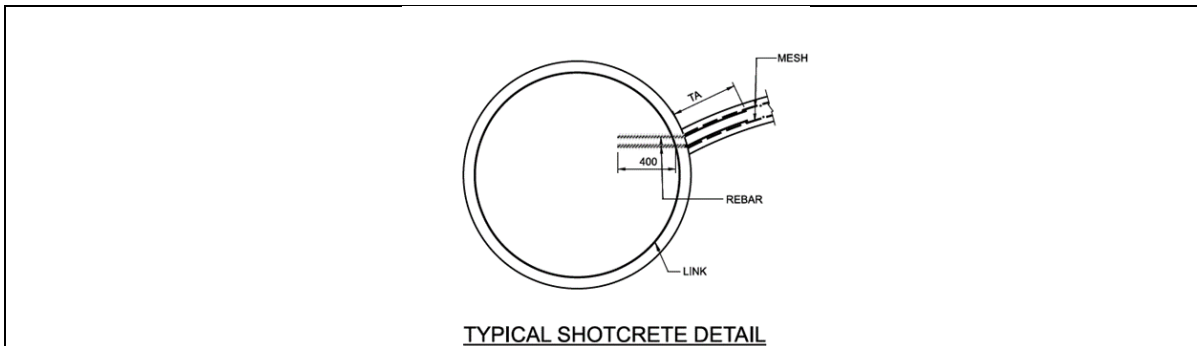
Example of Connection between Shotcrete and the ERSS Wall
